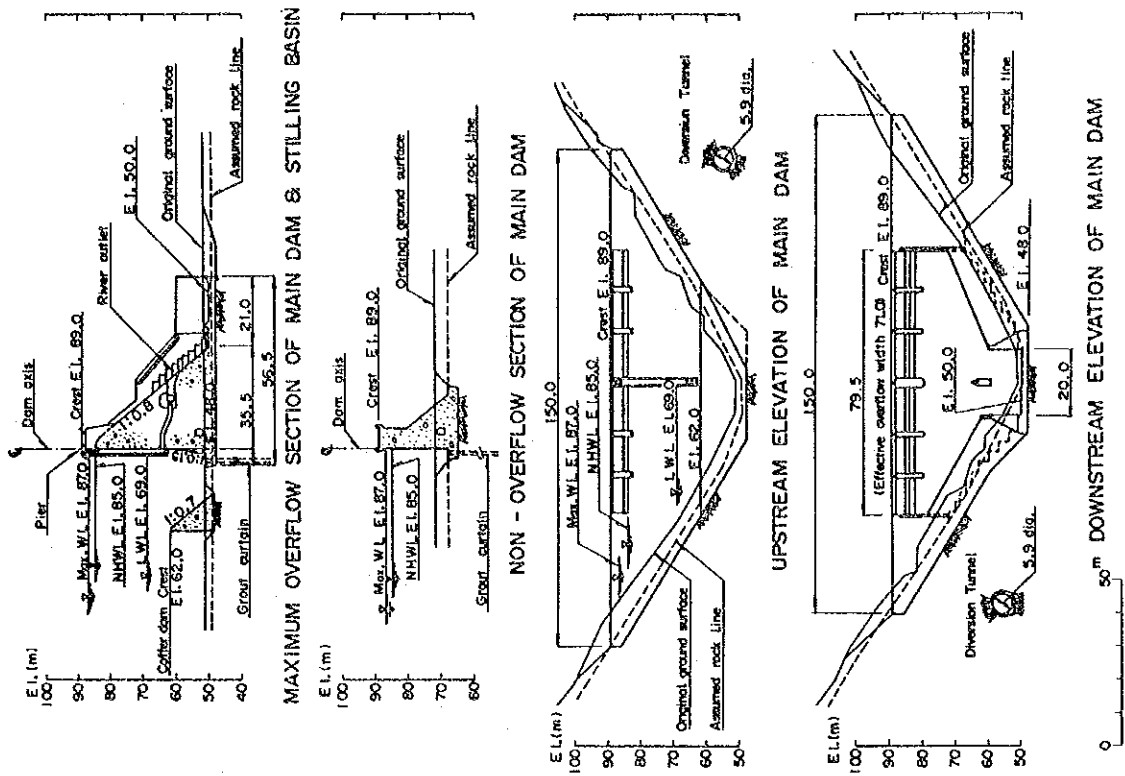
Plan, Elevation, Profile and Section of Badak-Temin Dam
